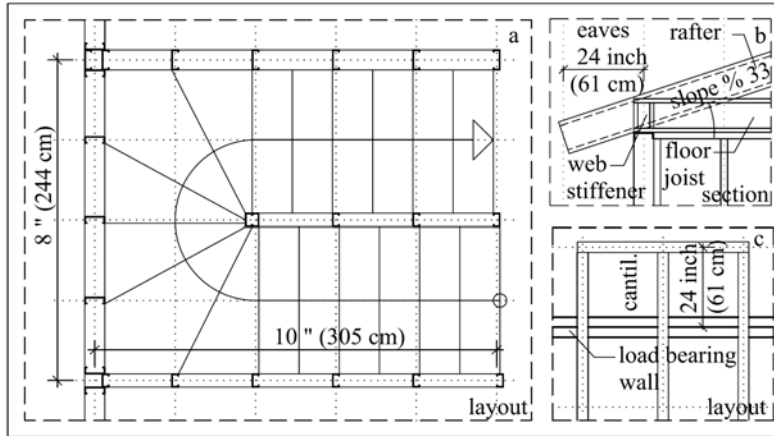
(a) Staircase type, (b) eaves type, (c) cantilever dimension
